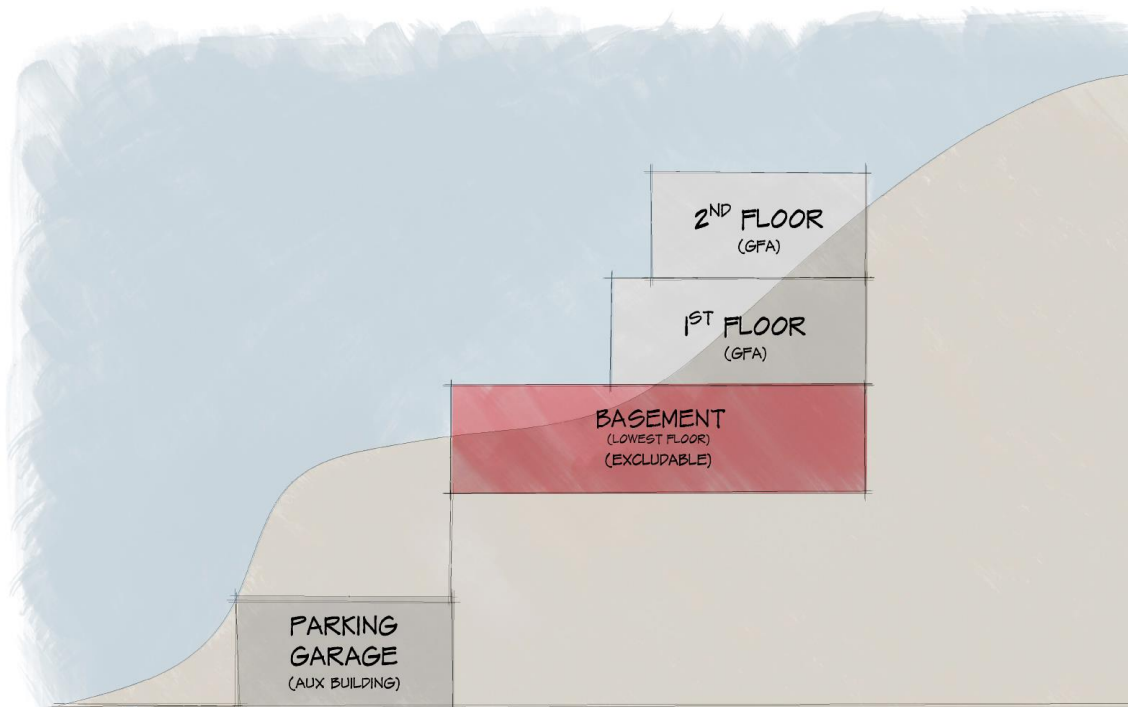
The in-ground basement definition applies to the lowest floor of the detached or duplex dwelling building. Where a parking garage is contained in a separate detached auxiliary building it is permitted as an excluded area, even if it is located below the elevation of the lowest floor of the detached dwelling.
